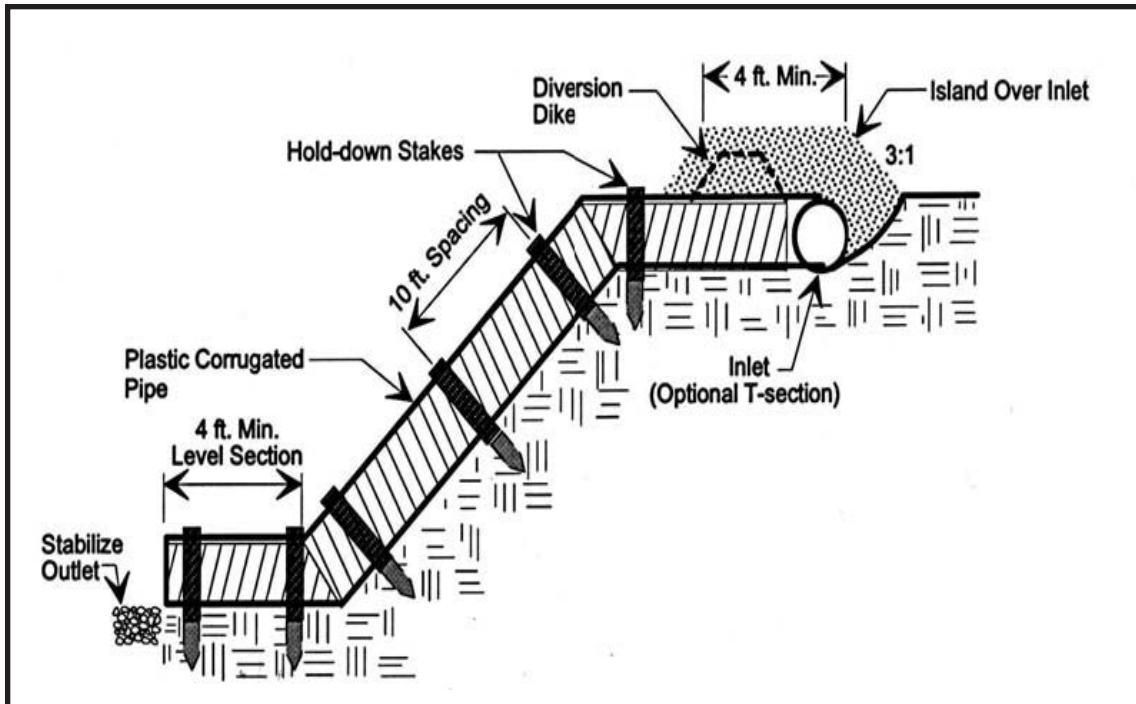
Typical Cross Section of Temporary Slope Drain with Optional T-section Inlet
